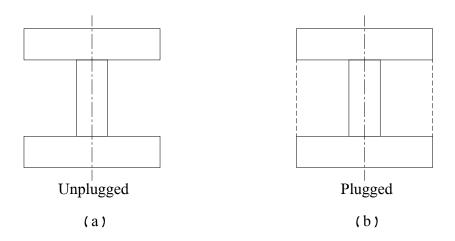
Plan view of the steel pile: (a) unplugged and (b) plugged
